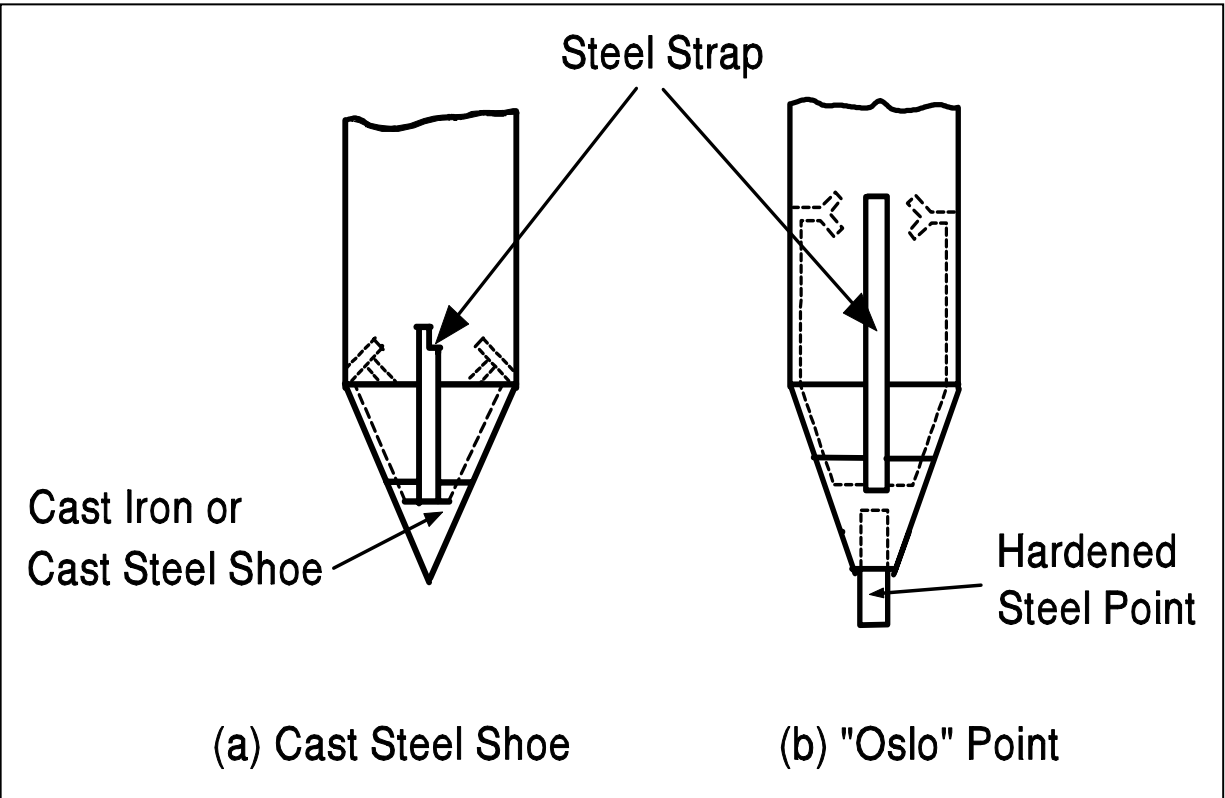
Pile Toe Attachments for Precast Concrete Piles
